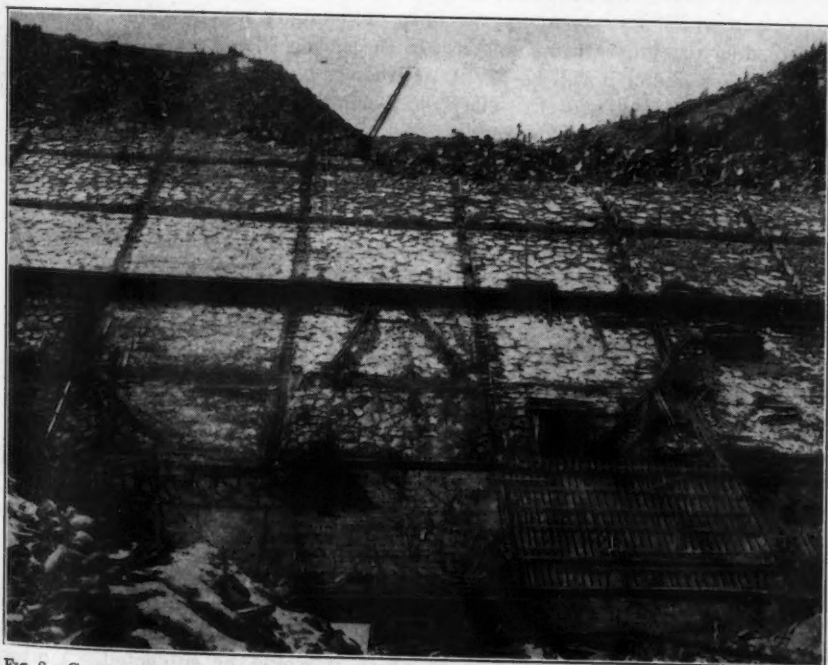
CONSTRUCTION OF RUBBLE CUSHION AND TIMBER SHEATHING AT BOTTOM OF SALT SPRINGS DAM
